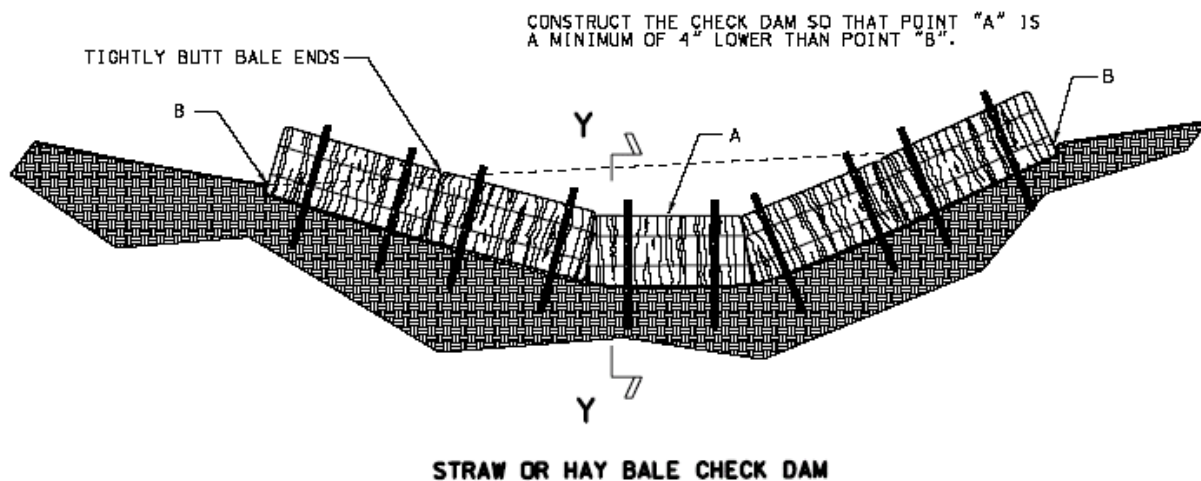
Straw Bale Barrier in Drainageway
